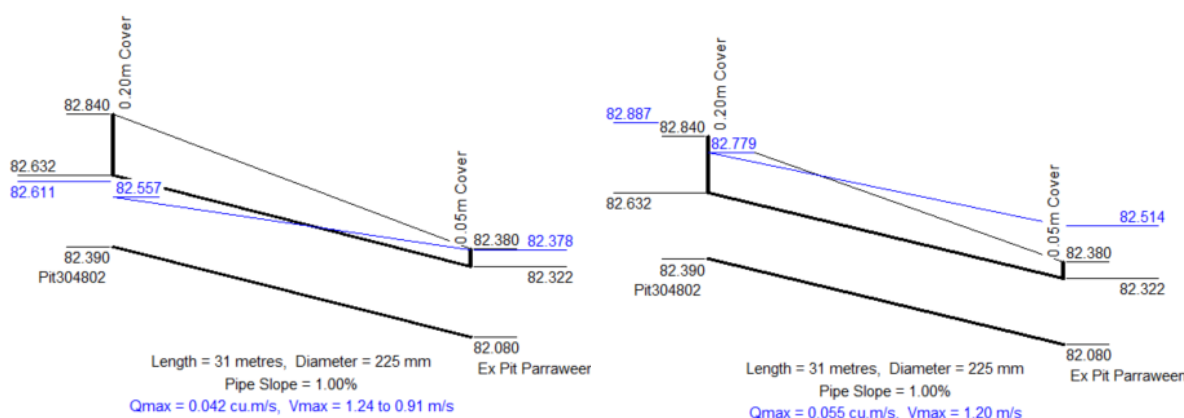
Parraween Street drainage extension longitudinal section – 10% AEP and 1% AEP
